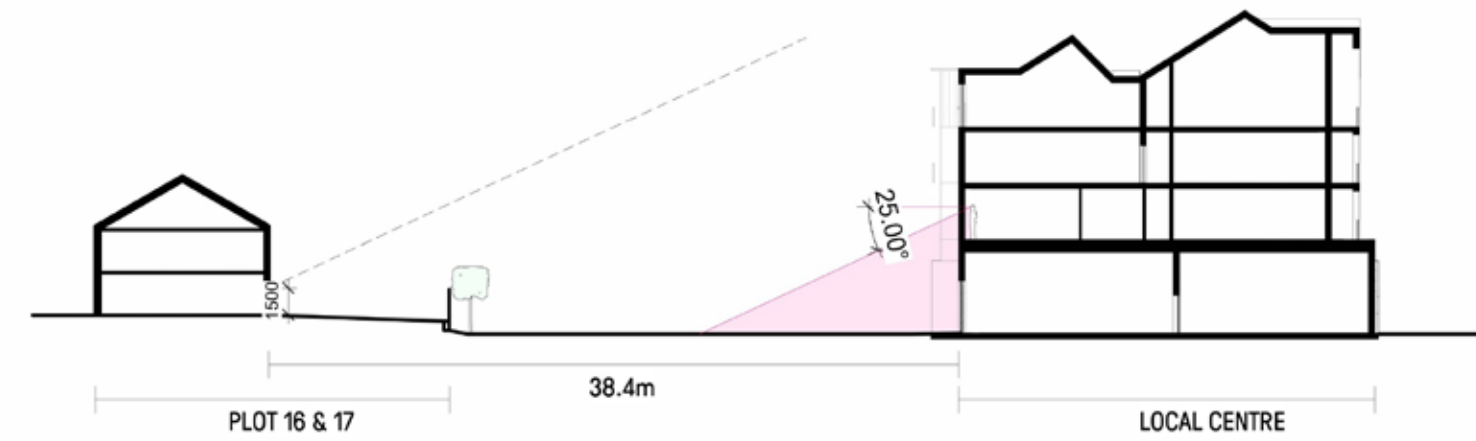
Local Centre & Plot 16 & 17 First Floor Privacy Section prepared for Design Workshop
